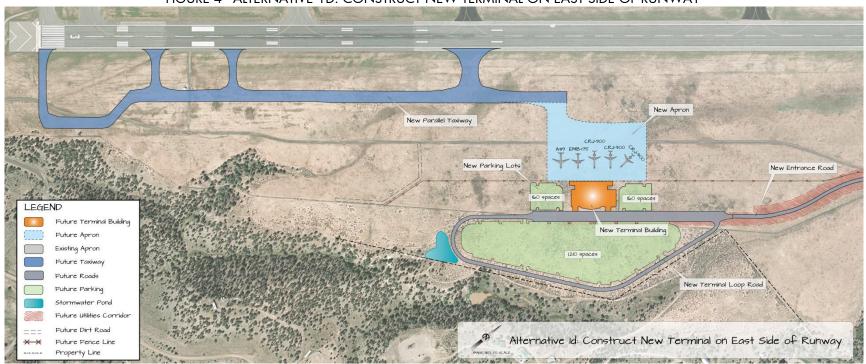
ALTERNATIVE 1D: CONSTRUCT NEW TERMINAL ON EAST SIDE OF RUNWAY
